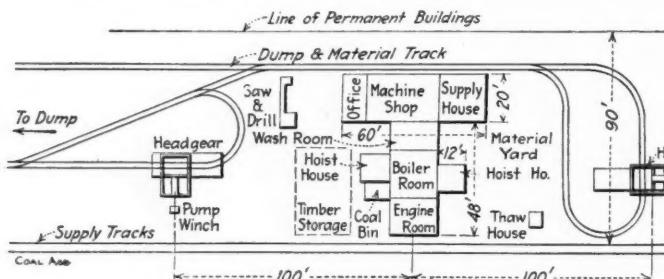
LAYOUT OF SHAFTS, TRACKS AND TEMPORARY BUILDINGS
